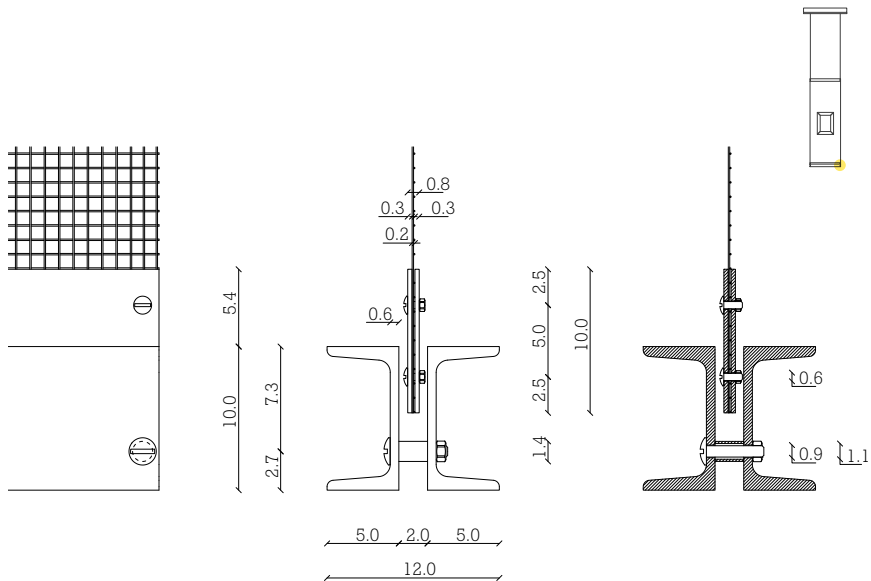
Construction detail - Structural joint of the display unit | Quoted elevations and section.
